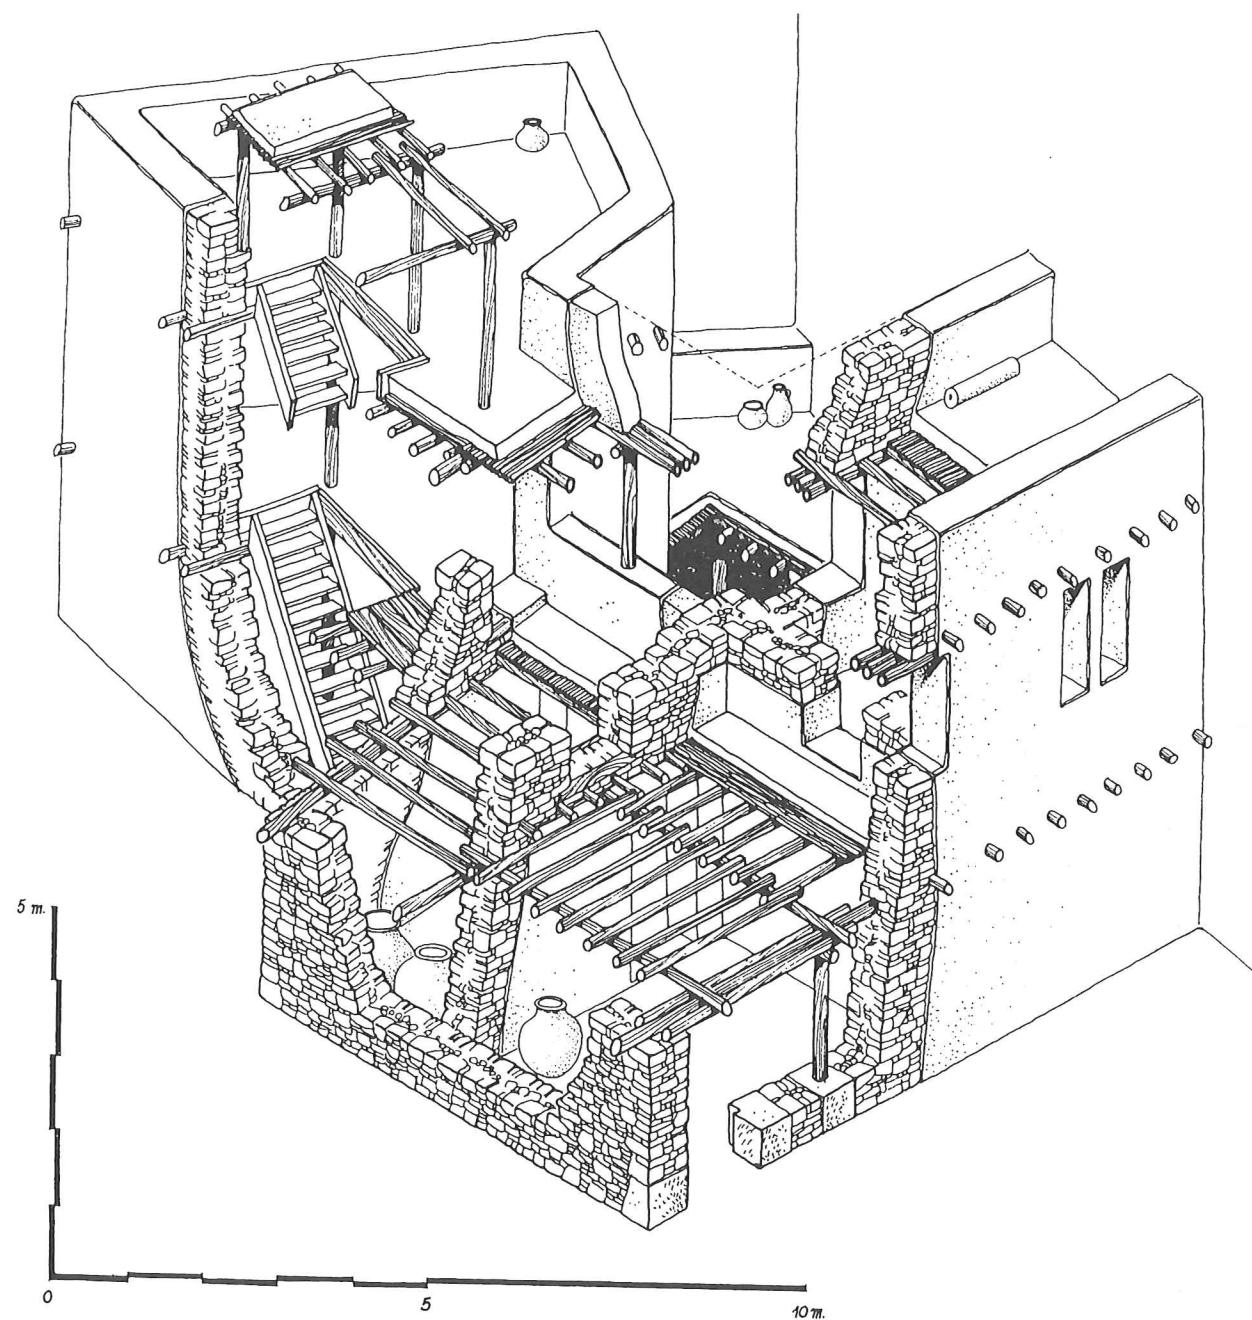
House D, Ville sud: proposed elevation (after Callot 1994).
